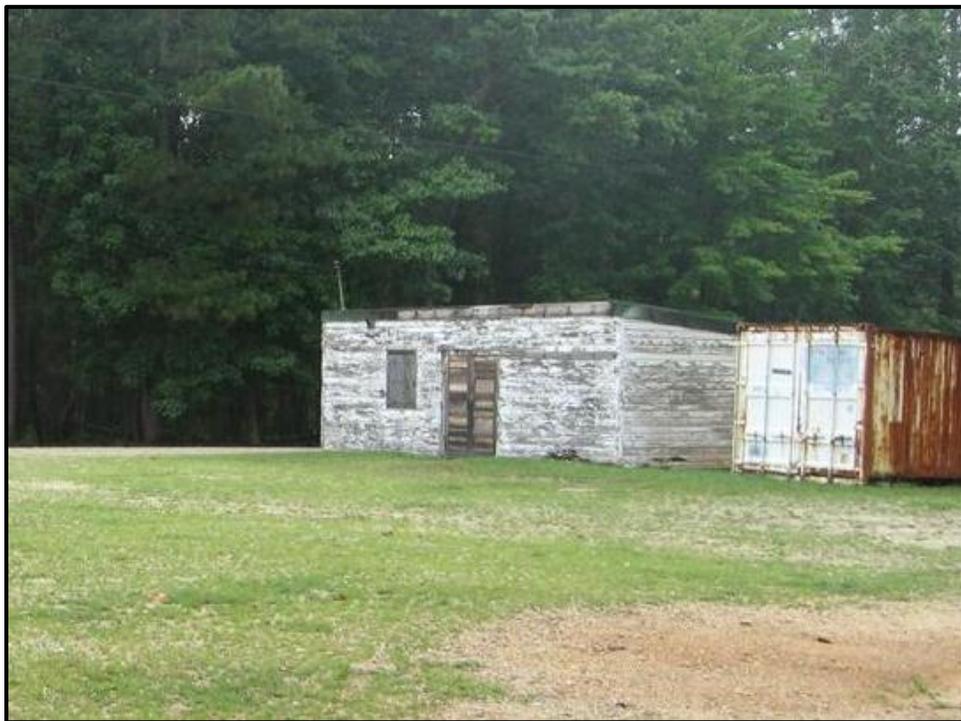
Range Target House (R0060), east and north elevations, facing southwest
